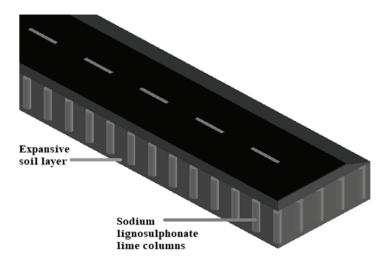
Sodium lignosulphonate lime columns under the pavement and embankment load
